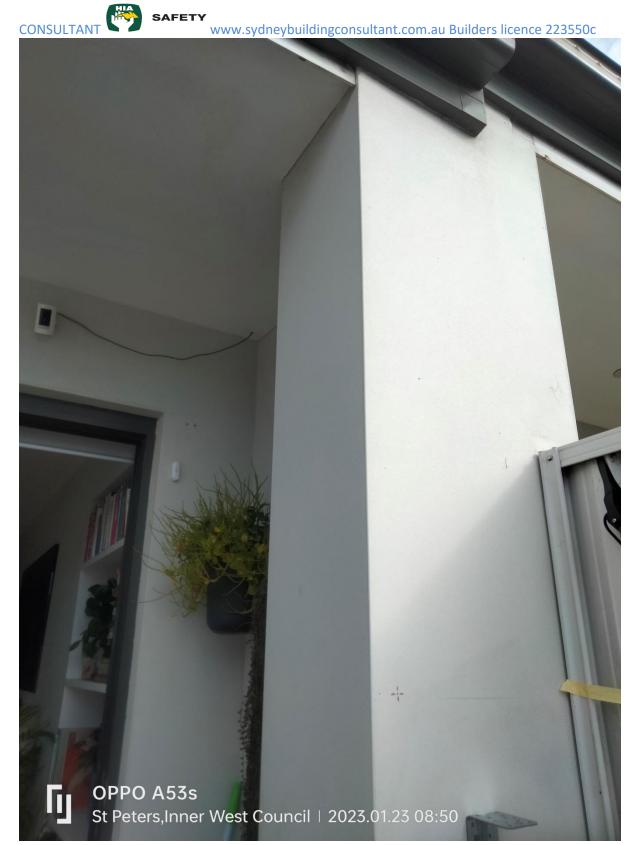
the interior dividing wall located between 116 and 118 was visually accessed by the home owner.
